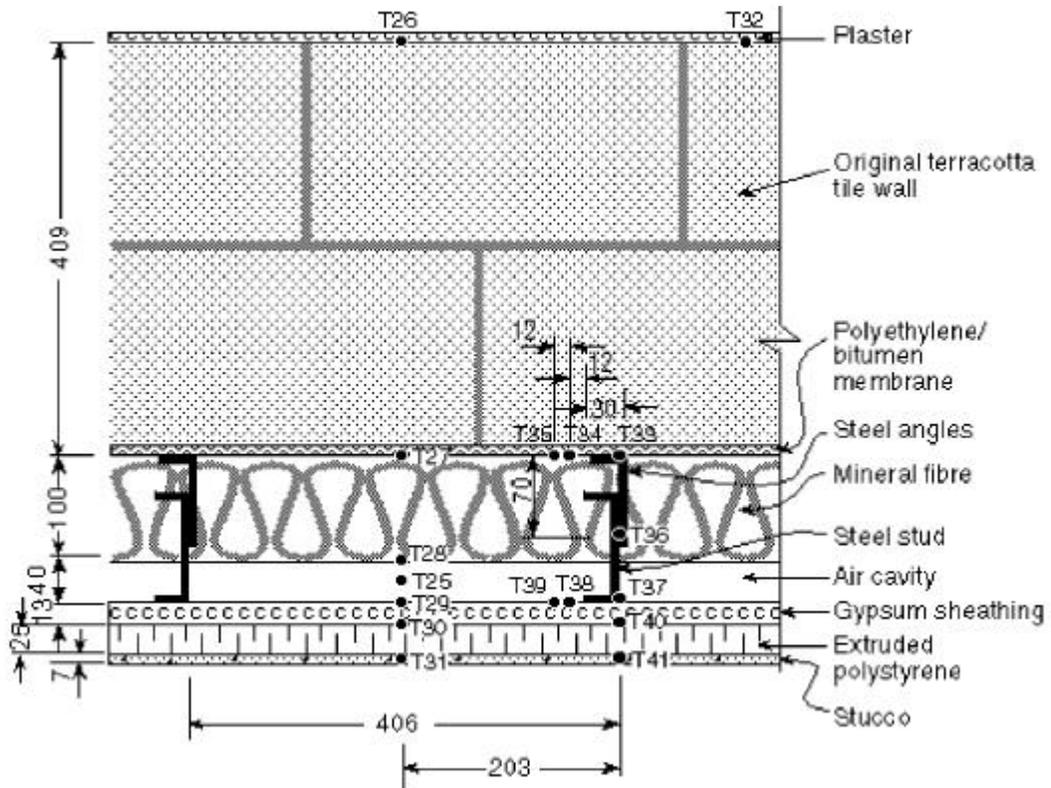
Plan view of east wall cross-section, including thermocouple array.
